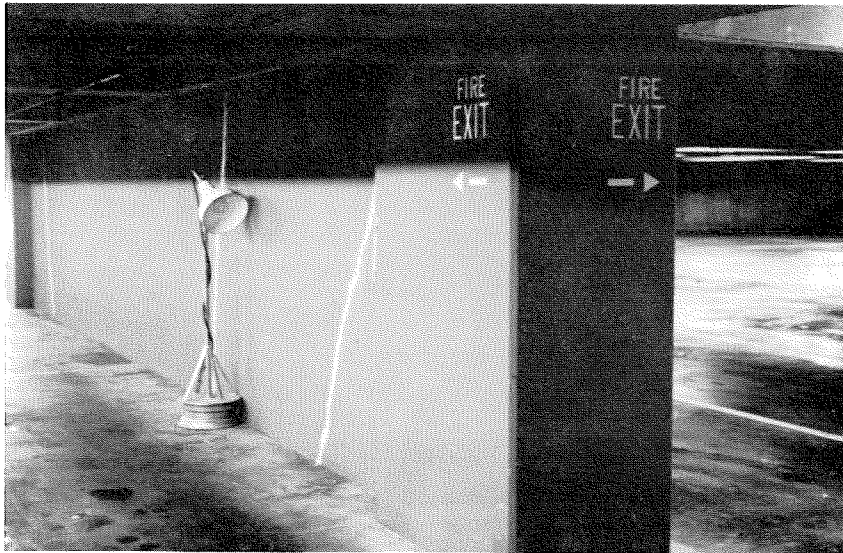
A light colored epoxy was used to fill cracks in this sub-basement interior wall aligned with the short dimension of the Union Bank building, Sherman Oaks.
